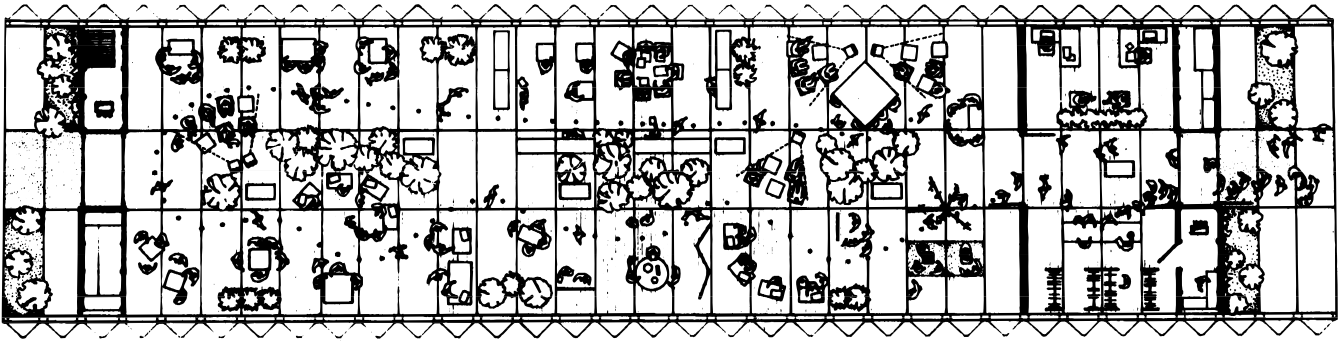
Plan of the IBM pavilion. From right to left: entrance, cloakroom and administration, main exhibition space, storage.
